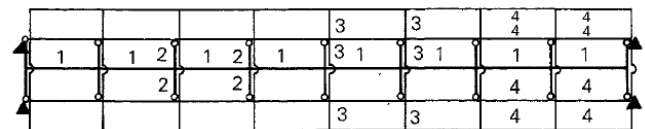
Grillage Analysis of a box girder (Hambly, 1991)
